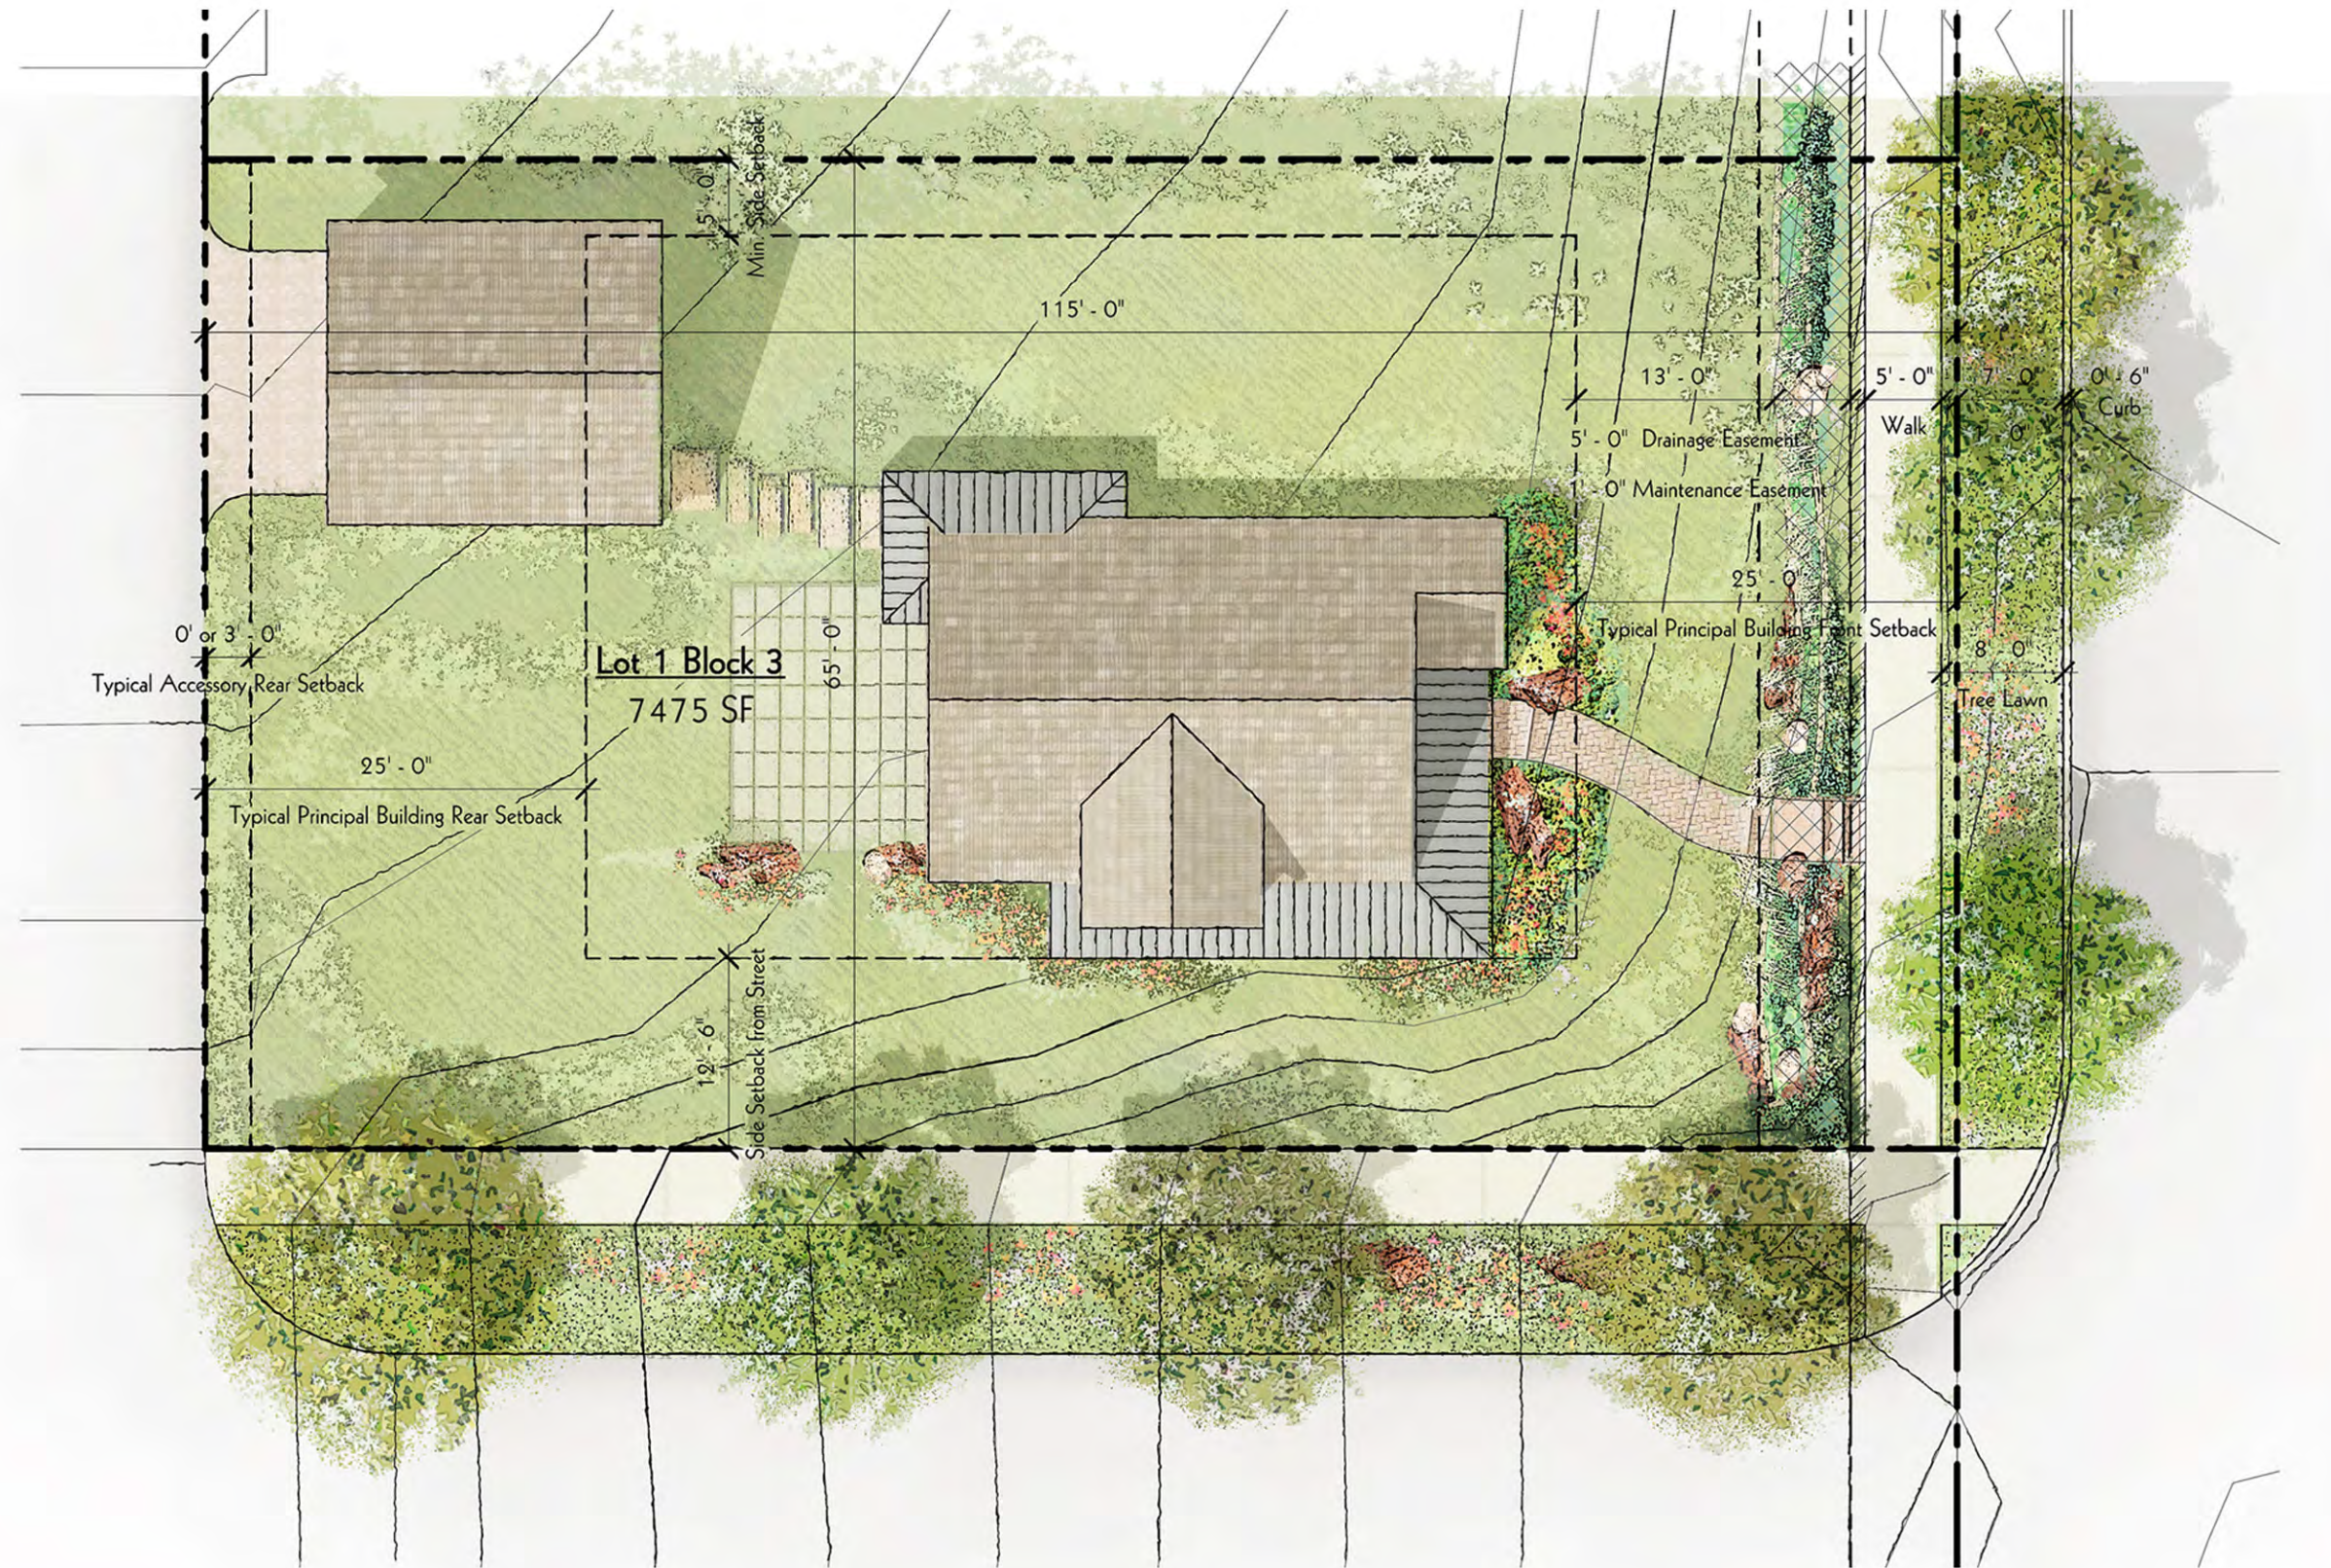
EXHIBIT K: PLAN VIEW OF CARRIAGE LOT
